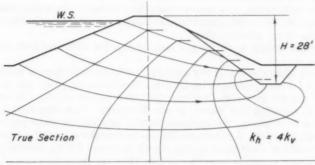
DETAILS OF TOE DRAIN DESIGN FOR IMPROVEMENT OF AN EXISTING LEVEE
